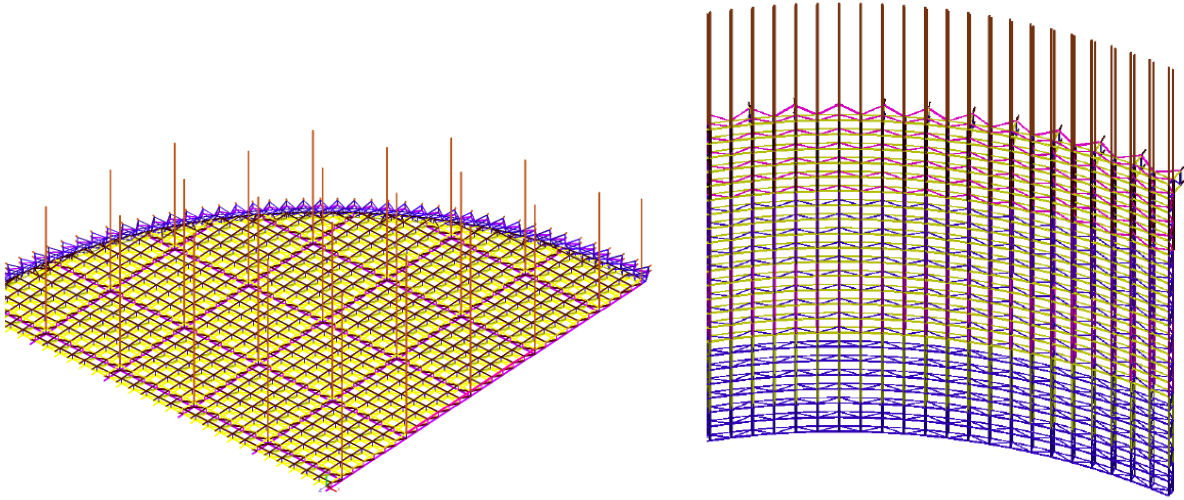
Schematic view of the top and barrel frameworks. The lines extending upward show the vertical pipes which are anchored to the dome ceiling for suspending the top/barrel frameworks.
